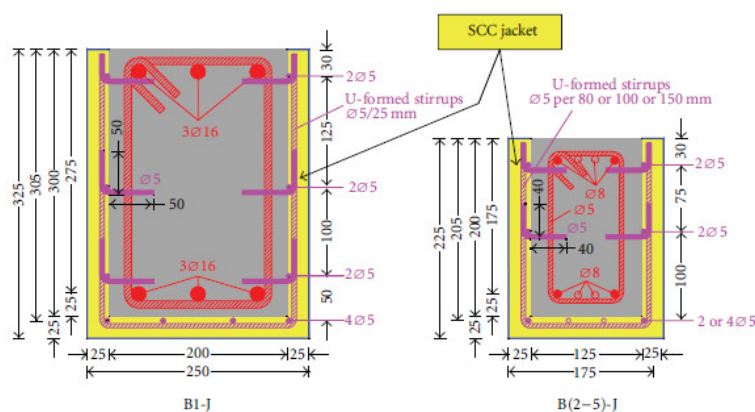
Cross-sectional dimensions and steel reinforcement arrangement of the jacketed beams (Chalioris and Constantin, 2012) - dimensions are given in mm.
